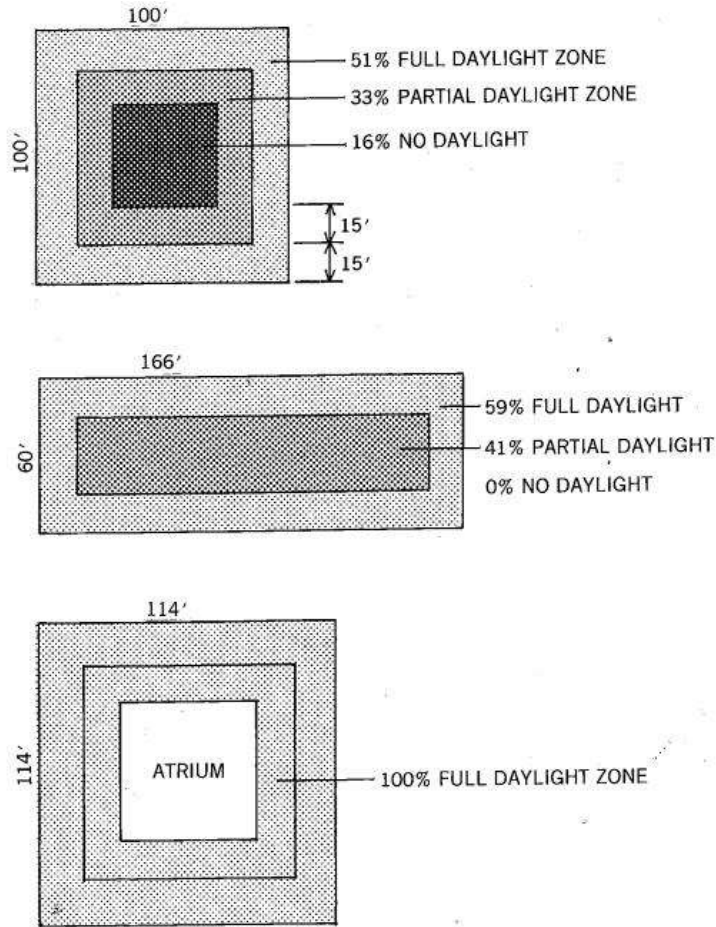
These were the common floor plans for large buildings prior to the twentieth century because of the need for light and ventilation.
